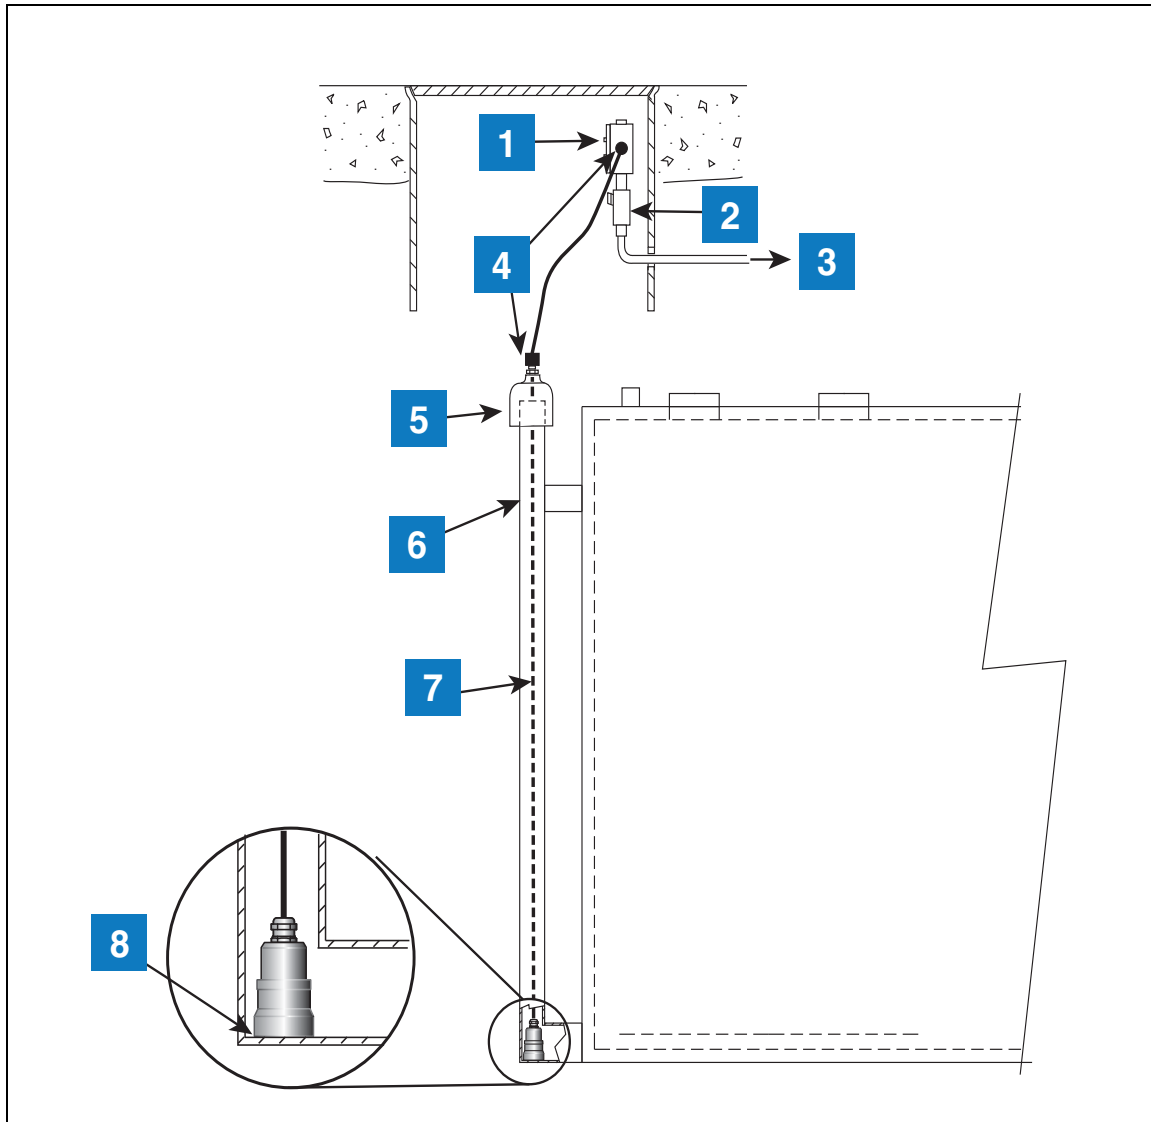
Example Interstitial Sensor Installation In A Steel Tank
